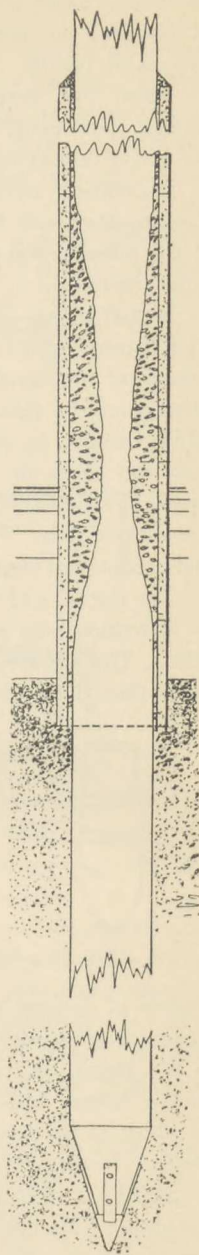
Application of Reinforced Concrete Slabs to Decayed Timber Pile.
